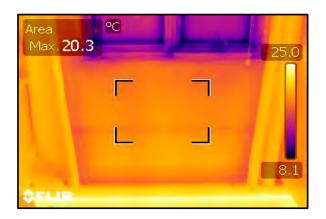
Thermographic scan of the kitchen window/wall assembly Building B.
